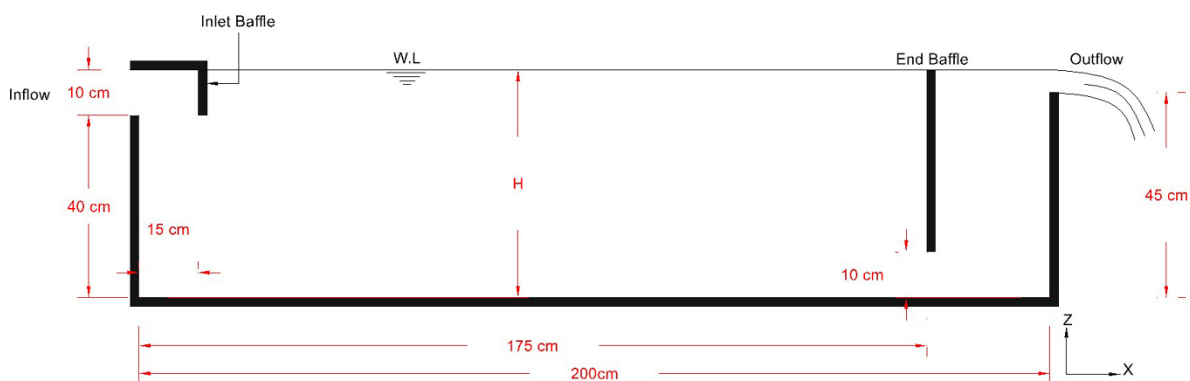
Longitudinal section for horizontal gravity separation tank (case study)
